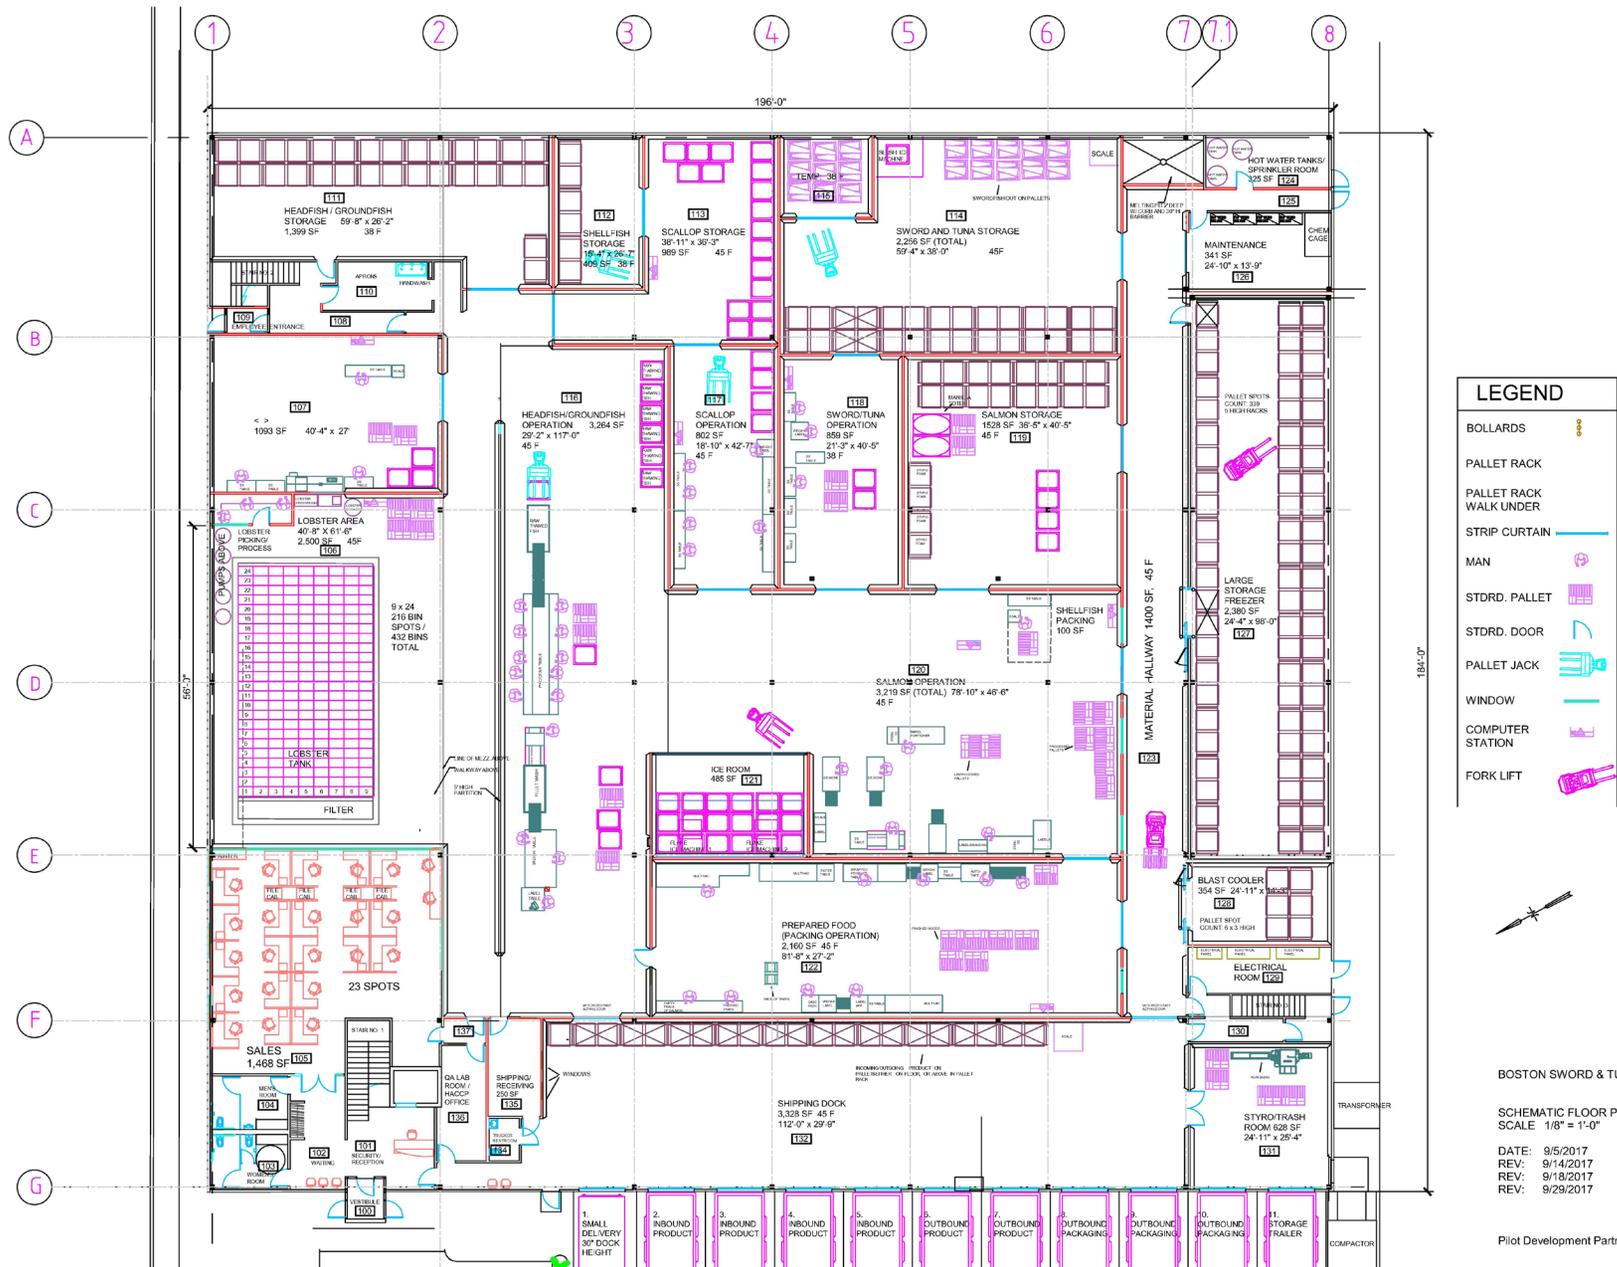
Boston Sword & Tuna. Schematic Floor Plan
